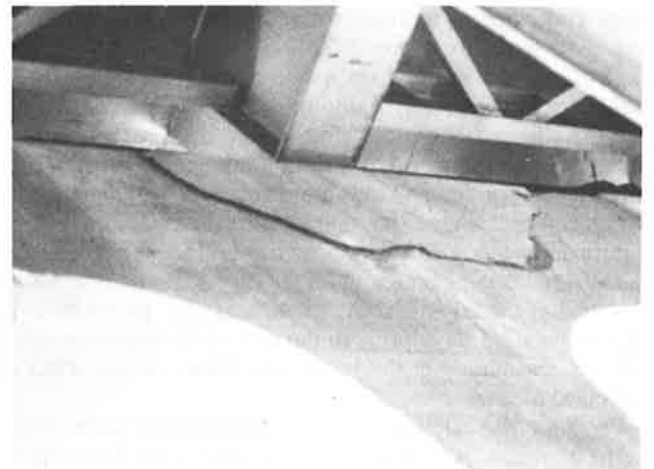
Spalling of a concrete pier due to thermal shortening of a steel girder
